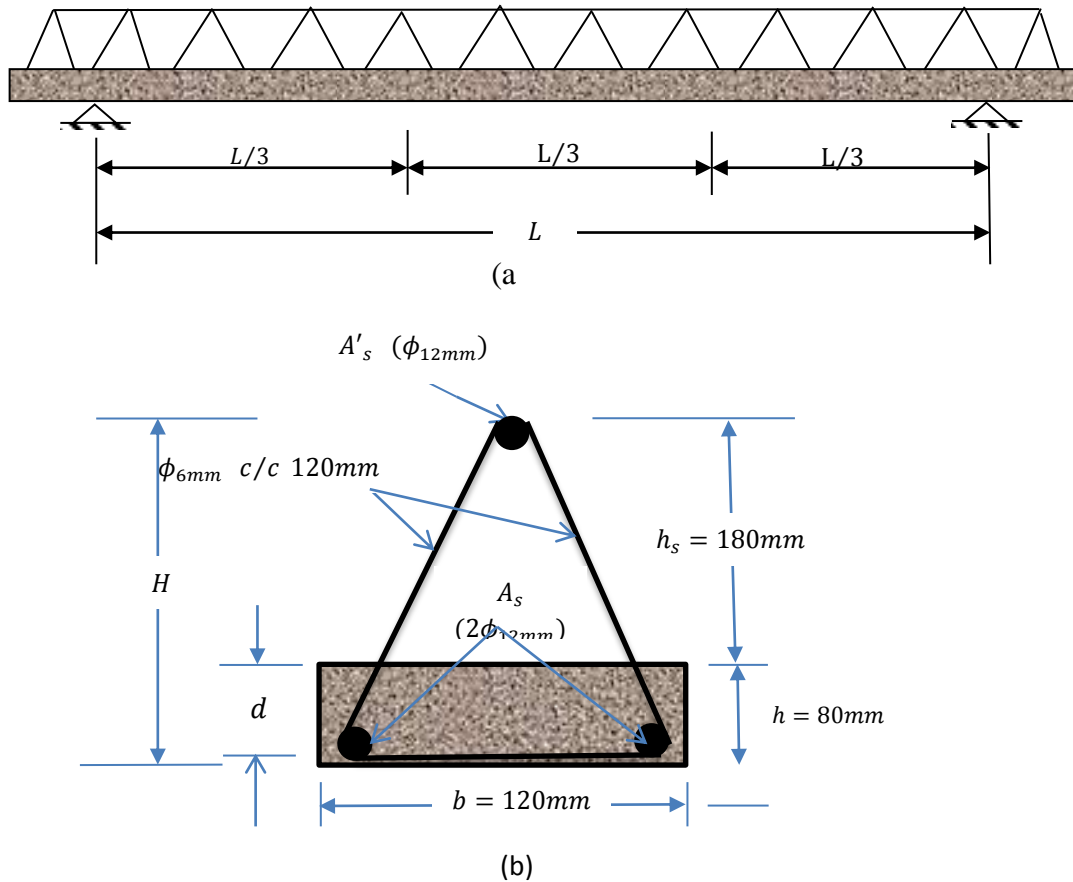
Pre-cast concrete beams: (a) longitudinal Pre-cast Beam section; (b) Beam section
